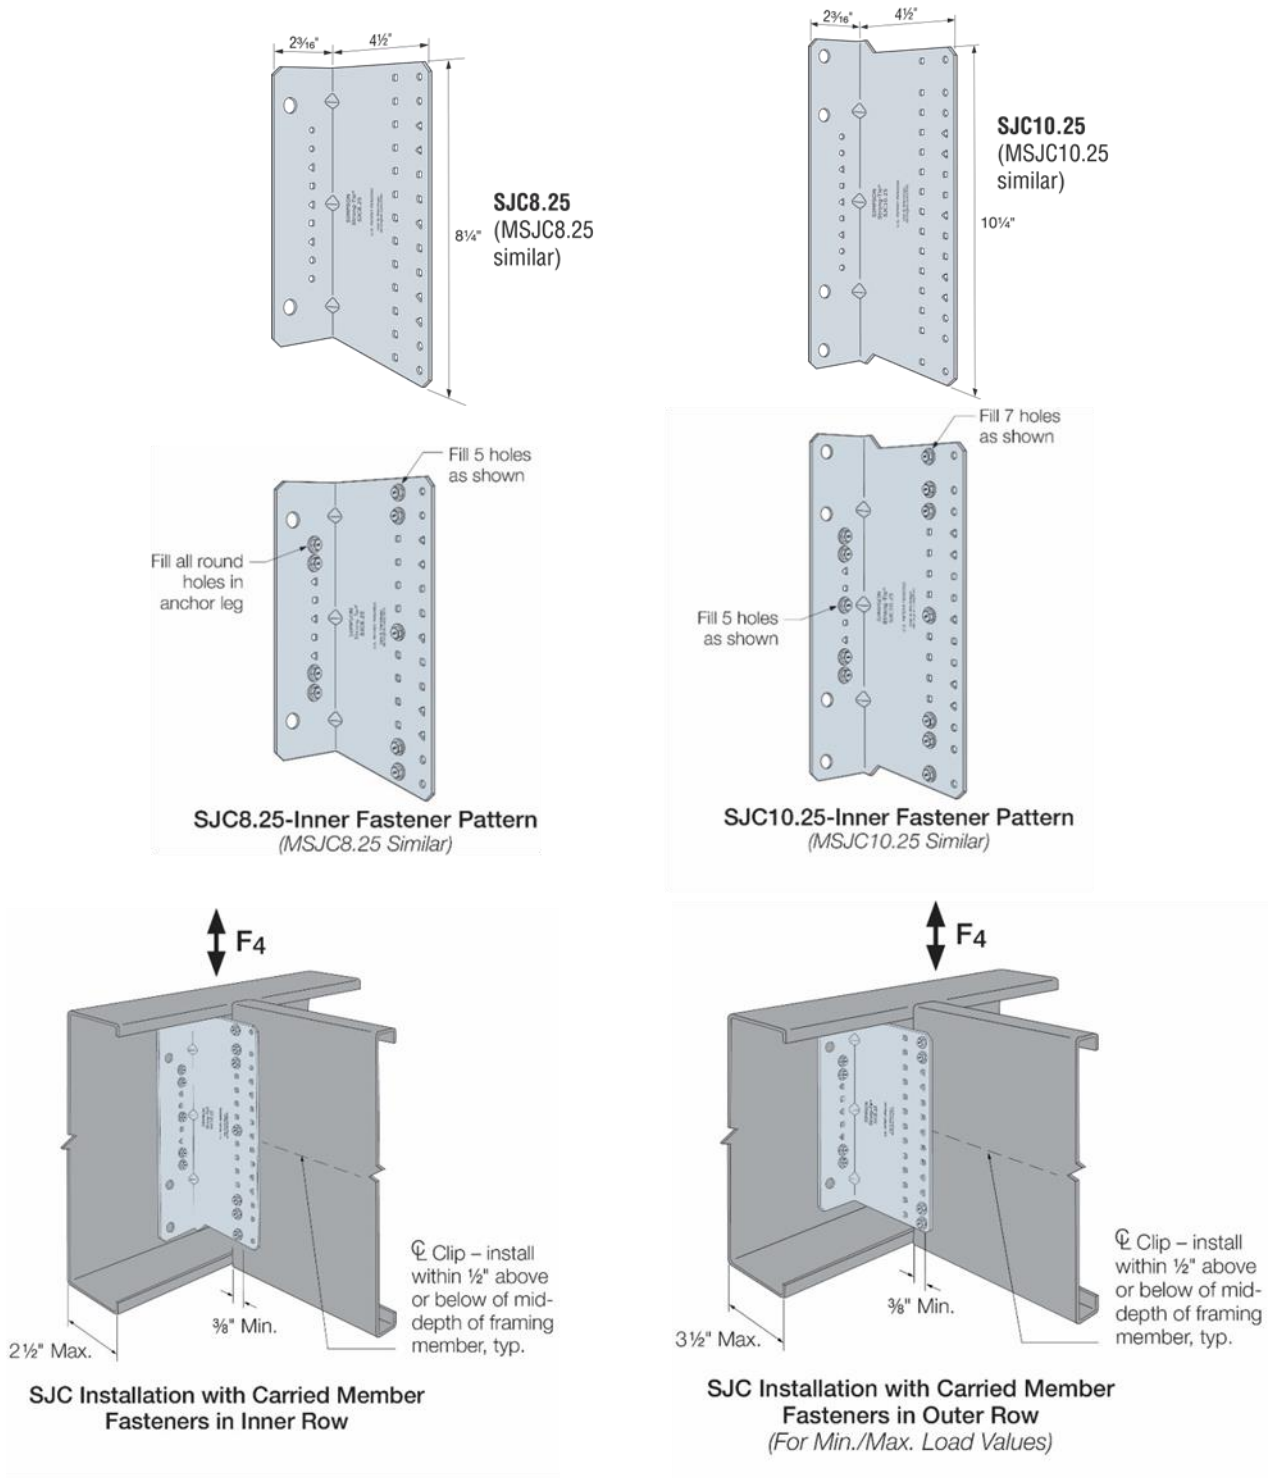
A—SJC SERIES STEEL JOIST CONNECTOR AND INSTALLATION DETAILS
